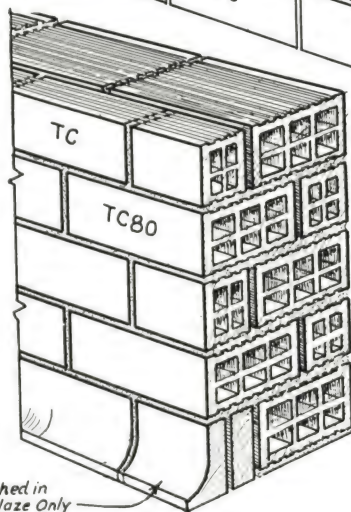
" x 12" FACE TILE WALL SECTIONS
